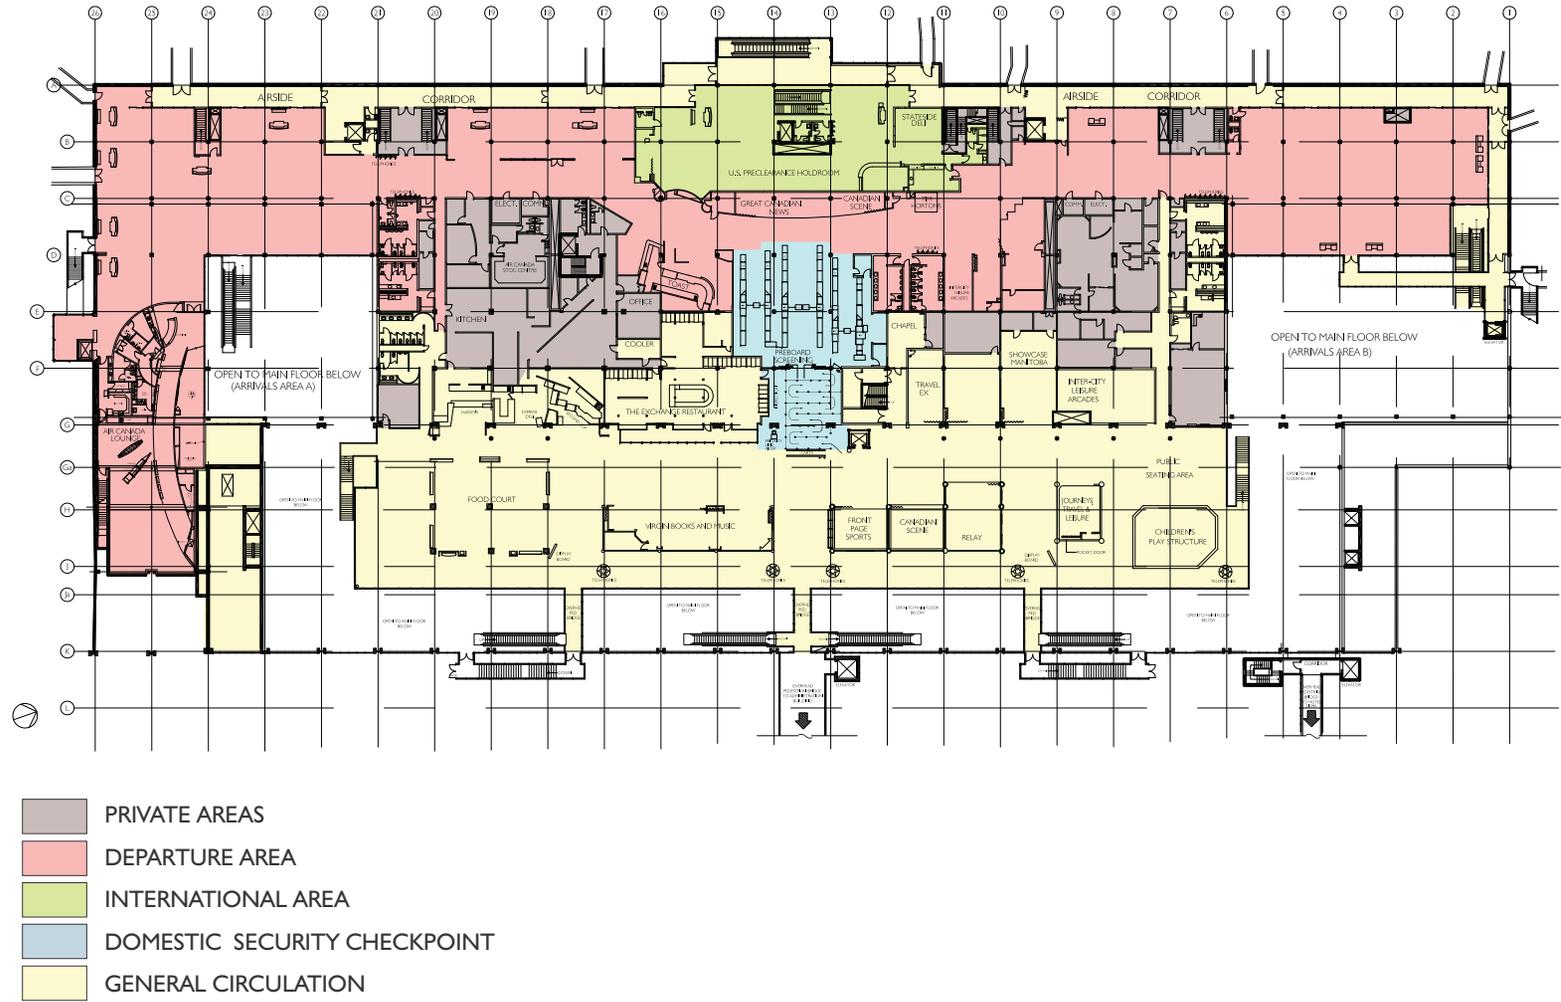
Second Level - Existing Winnipeg International Airport Floorplan
